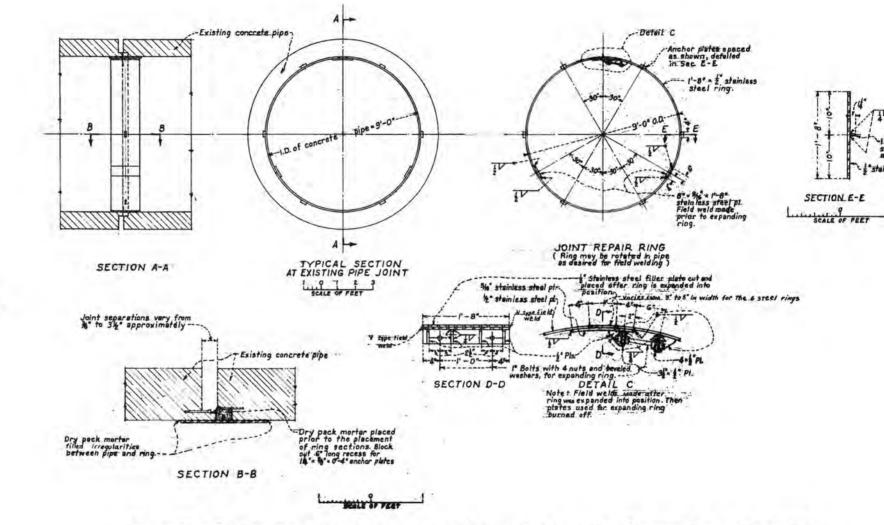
Sketch illustrating method of making joint repairs for precast concrete pipe conduit as originally included in the specifications. From drawing No. 783-D-771.
